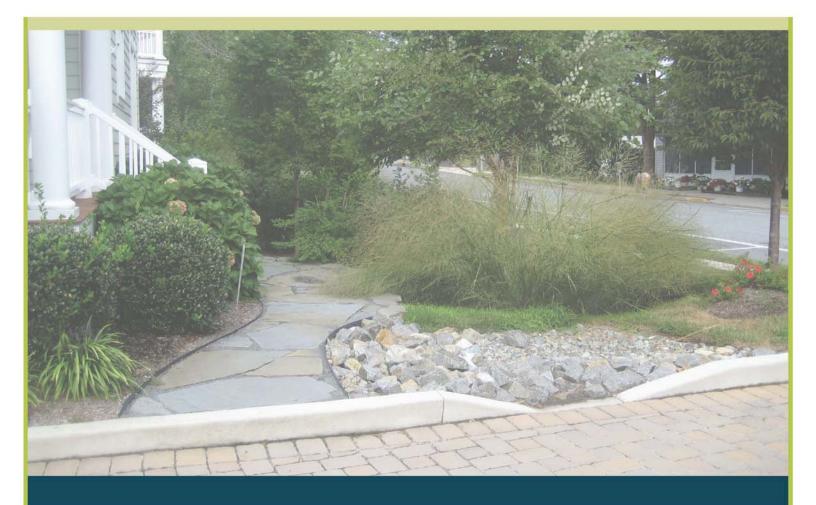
Concrete Apron and Depressed Curb Provided at Maintenance Access
